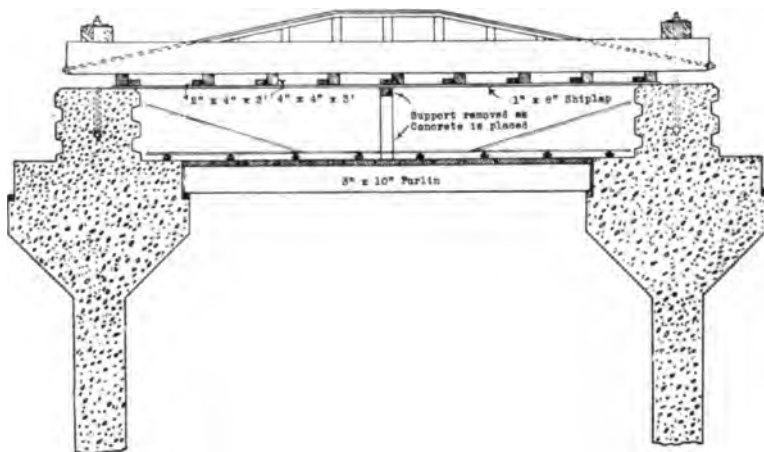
METHOD OF ANCHORING DECK SLAB FORMS.
